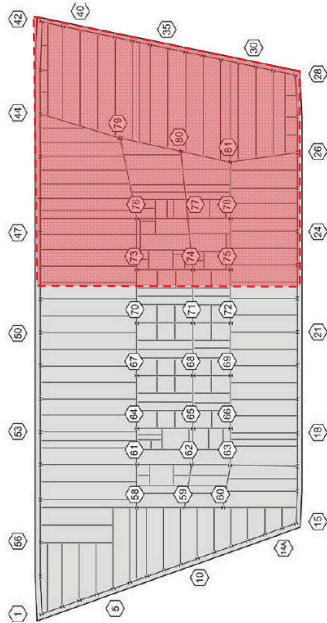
Extent of floor area of structural fire model of level 13 (shaded in red)
